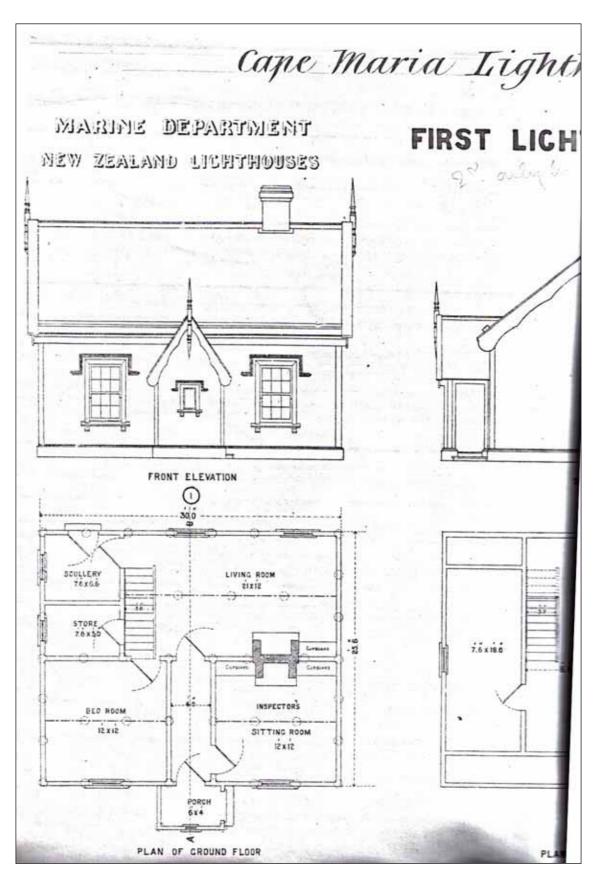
Design MD 45 for original 1880s 1st Light Keepers house (see No 2 on Previous page Plate 3)
